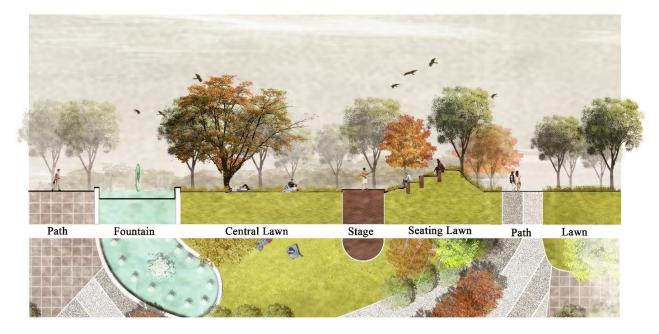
Section of Zhengxin Park design area 1:200. Source: by author
